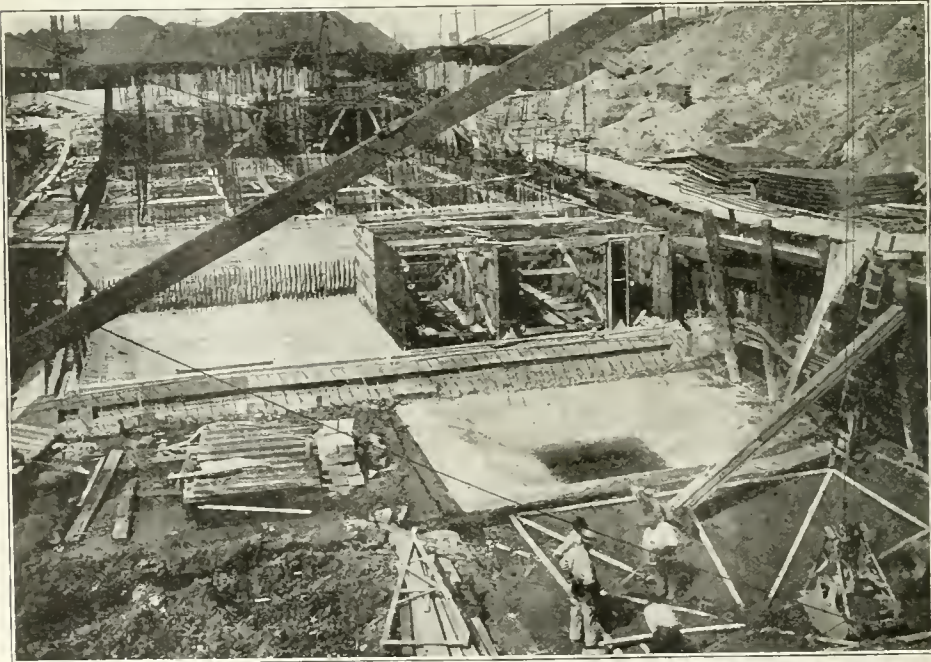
METHOD OF CONSTRUCTING CONCRETE FLOOR OF IMHOFF TANKS IN WESTERLY SEWAGE TREATMENT WORKS, CLEVELAND, OHIO.
